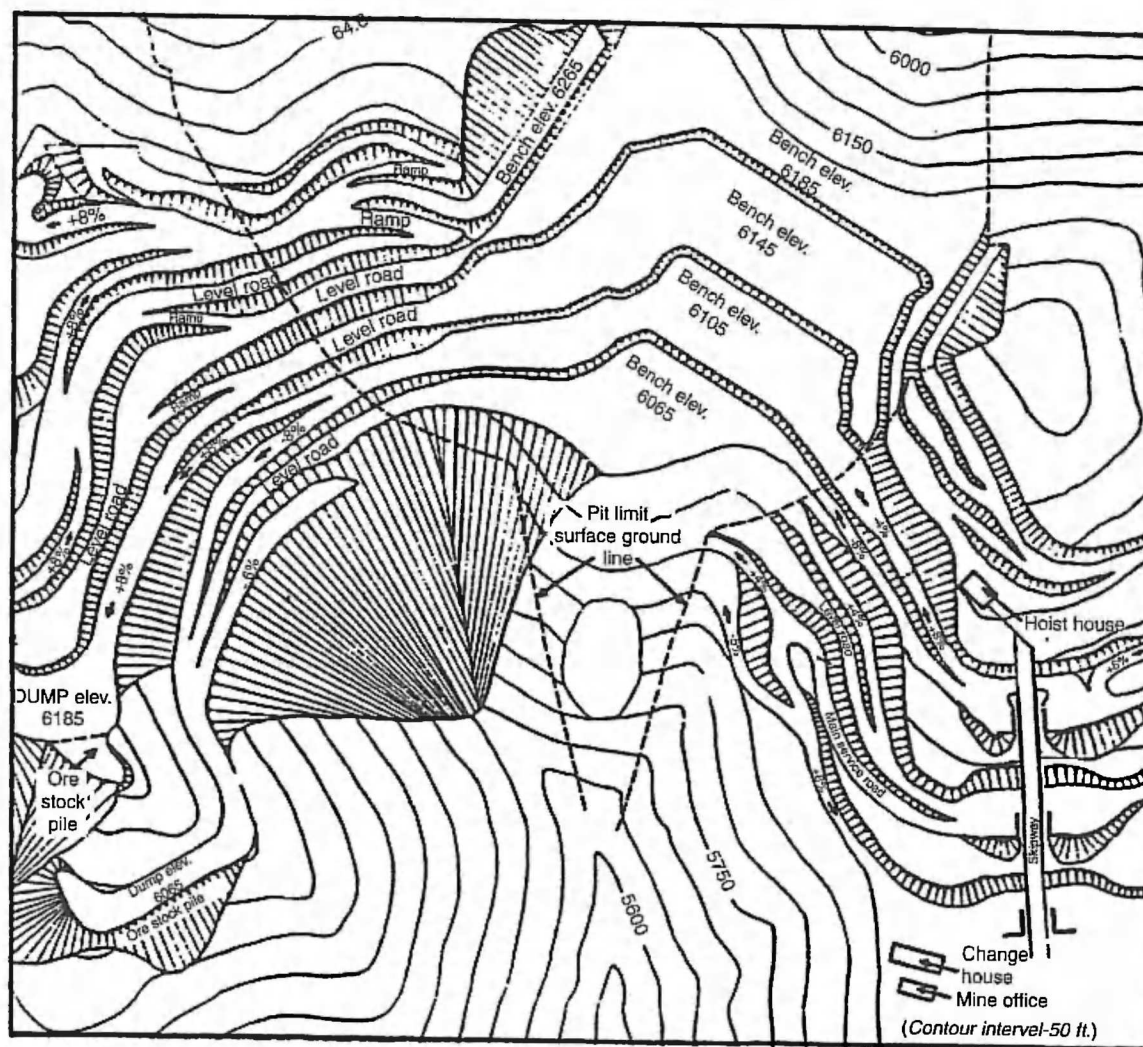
Example of slope surface shading described in Figure 4.78 (Ramsey, 1944).
